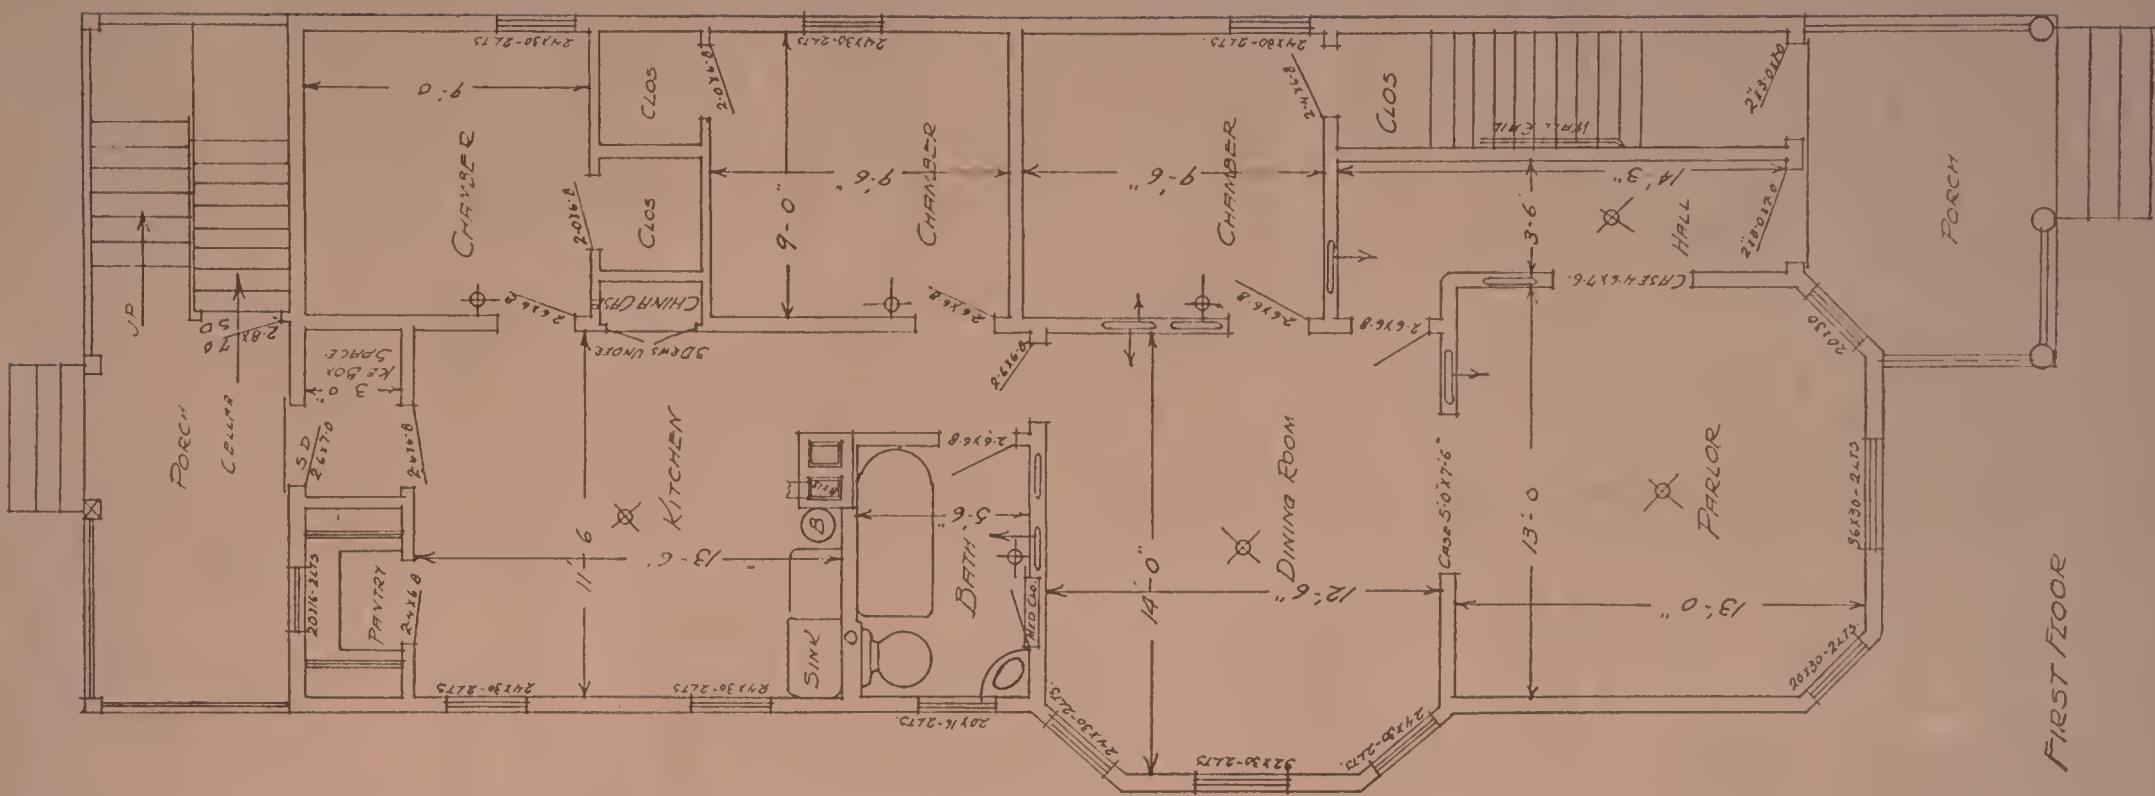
PLATE XIVa.—First floor plans of two-family house erected at Schenectady, N. Y., from plans drawn by C. G. Van Rensselaer of Schenectady, N. Y. Cost, \$3,400.00.
